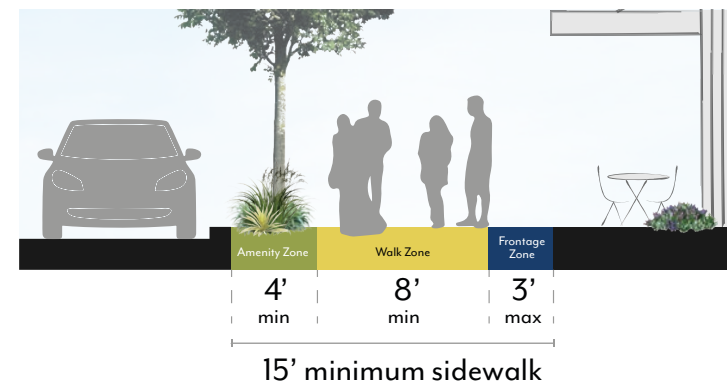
Sidewalks - Allen Avenue (Gateway and Wanut Commercial)
